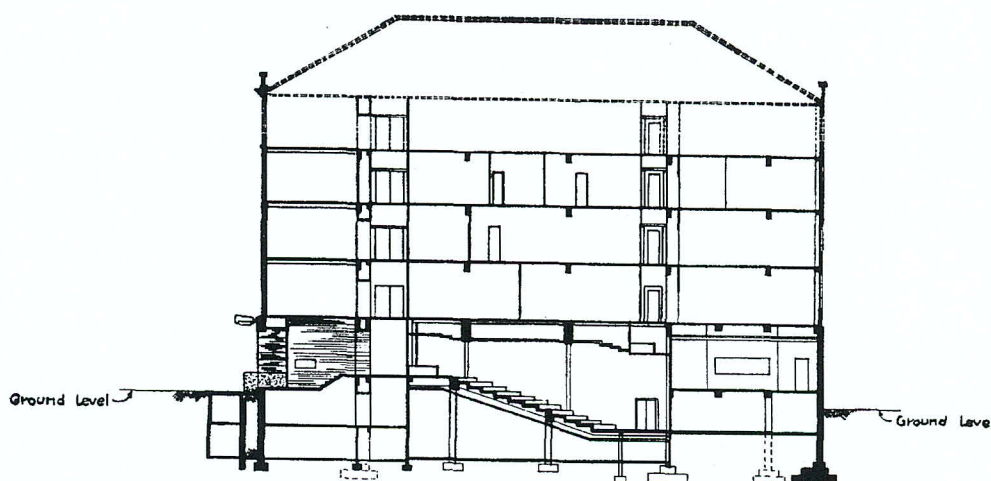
North-South section of the physics building. In addition to the existing four floors and basement, a proposed fifth floor and sloping roof are indicated.
